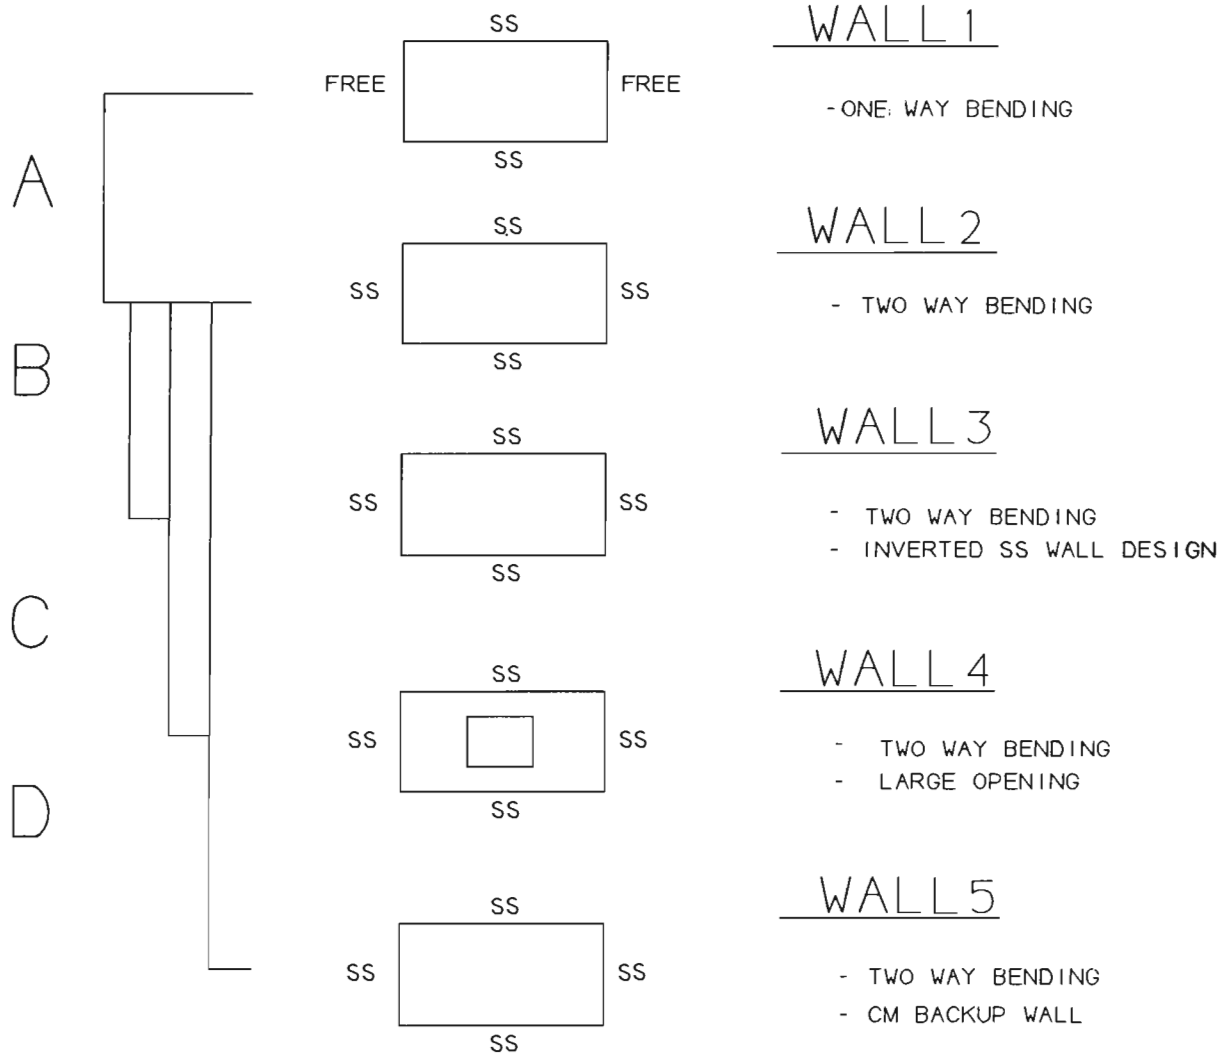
SPECIMEN CONFIGURATIONS
